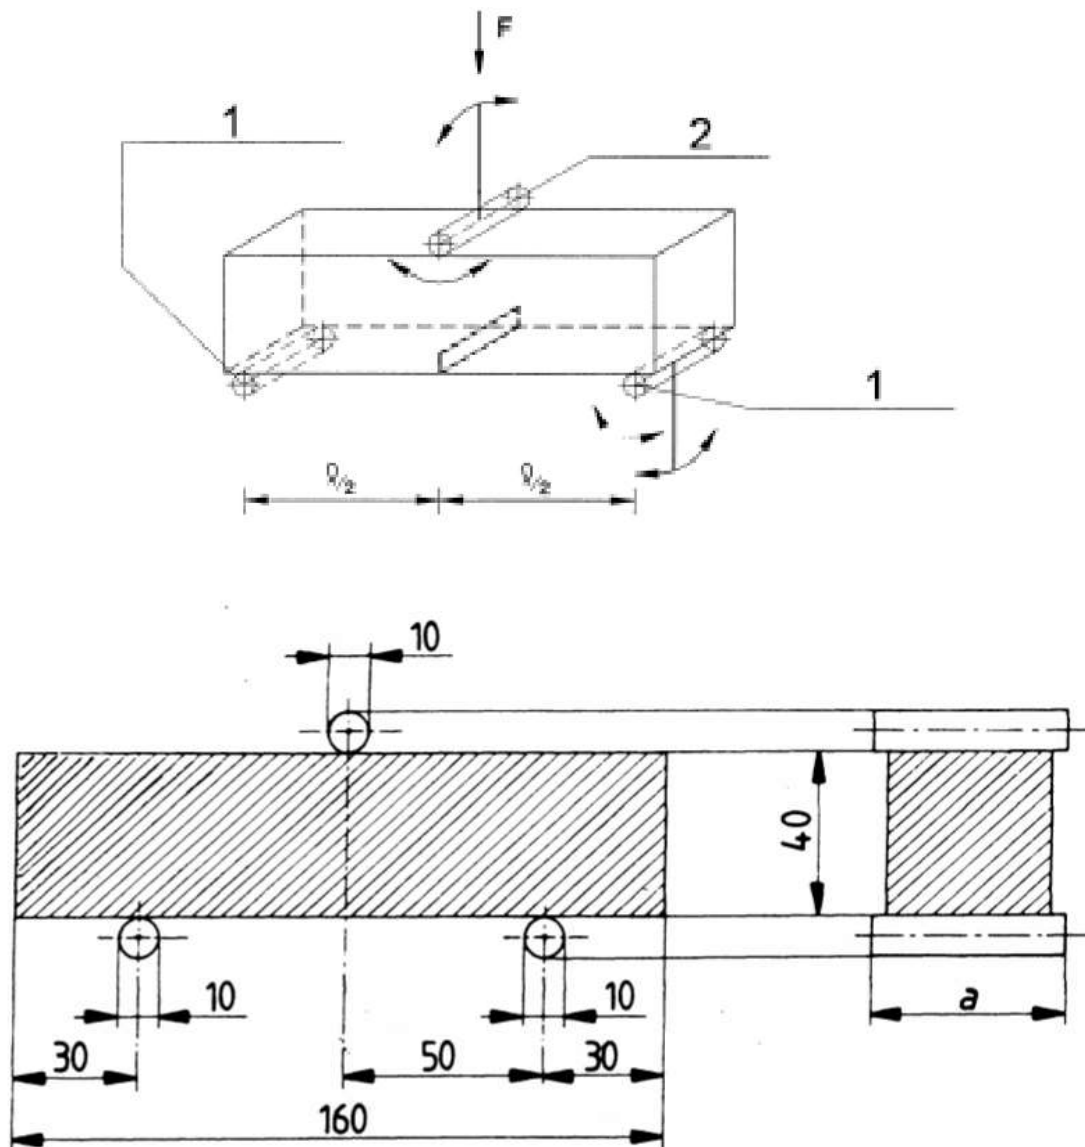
Arrangement of loading of test specimen, 1-Supporting roller, and 2-Loading roller
